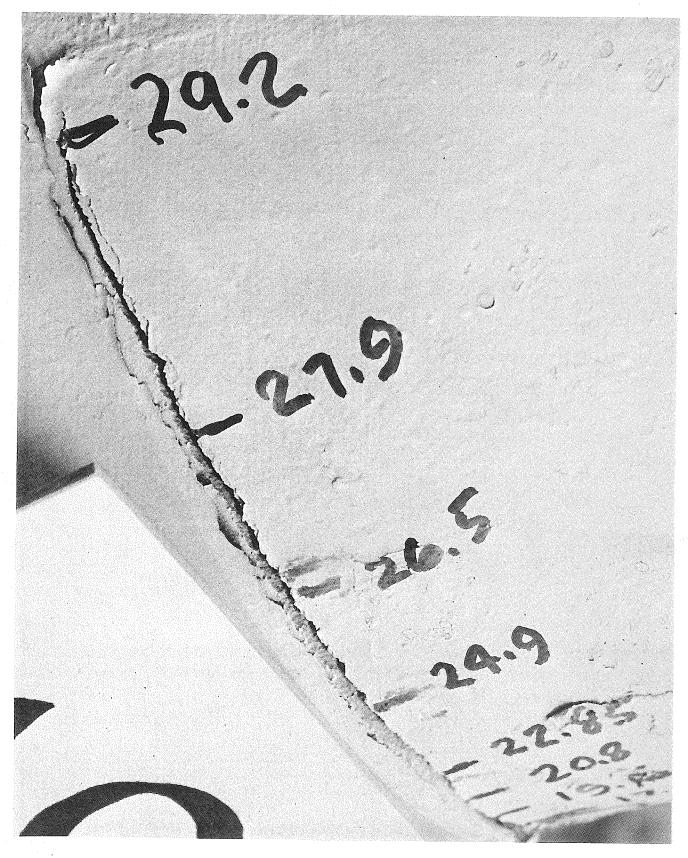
JOINT TYPE 3 - SPECIMEN No.6 (TAPERED GUSSET PLATE) DETAILED CRACK PROPAGATION IN DIAGONAL MEMBER
